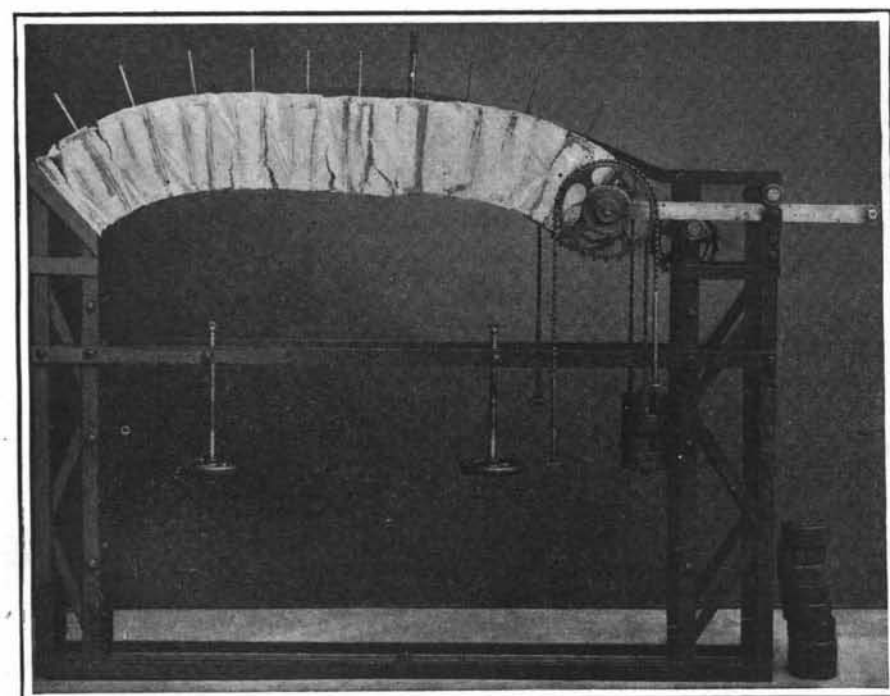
Arch under load, showing breaks at crown and abutments.
